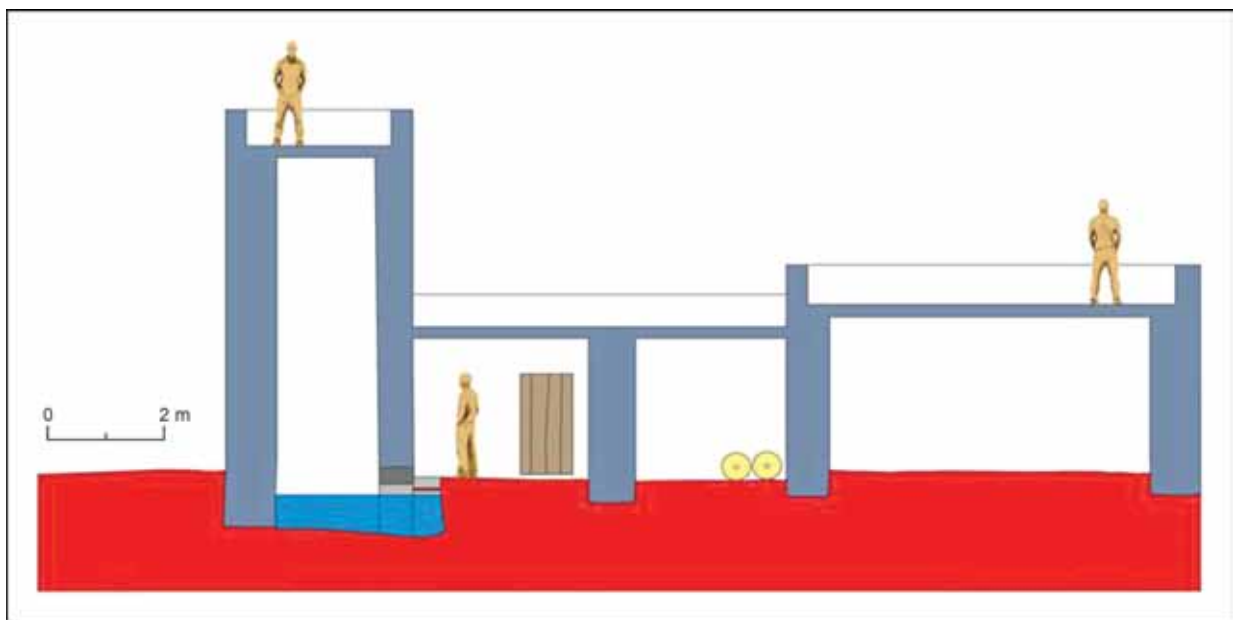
Al-Qusur, Courtyard 26. Building II, hypothetical building reconstruction.
